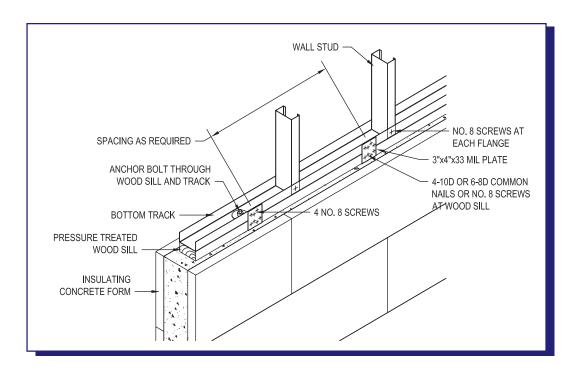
Track to ICF Wall Connection with Wood Sill and Steel Plate
